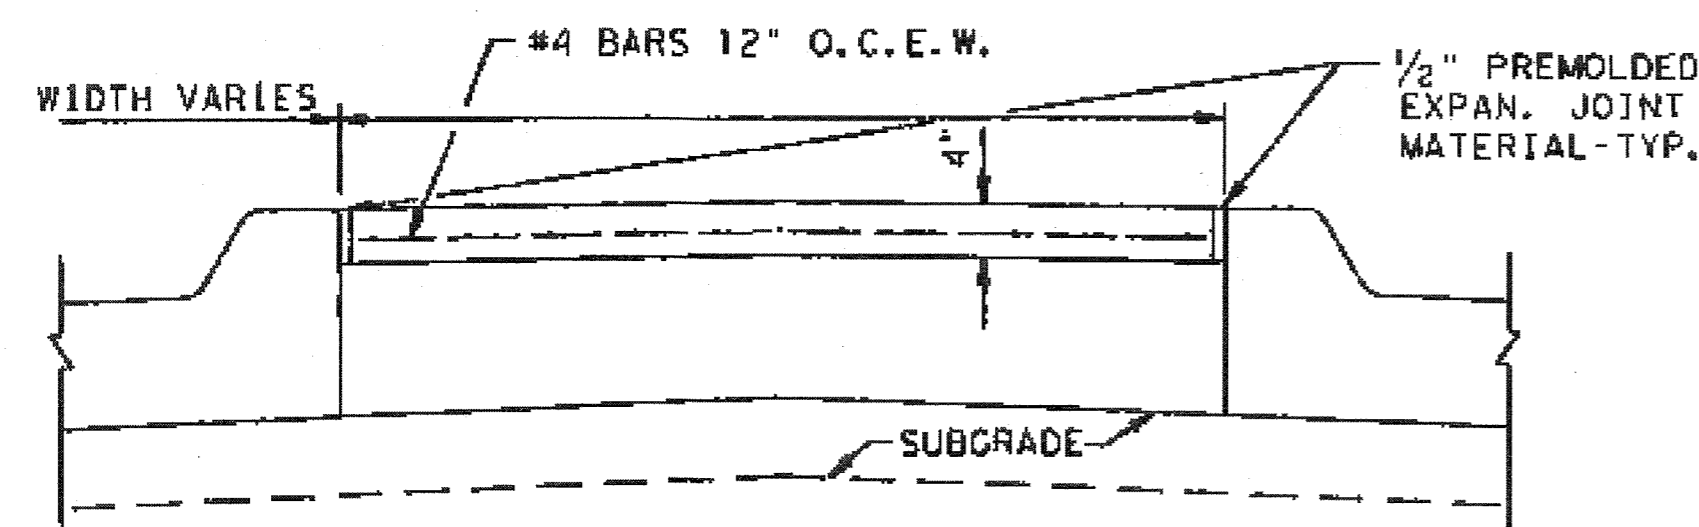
DETAIL AT PAVED TRAFFIC ISLANDS & MEDIAN NOSES
